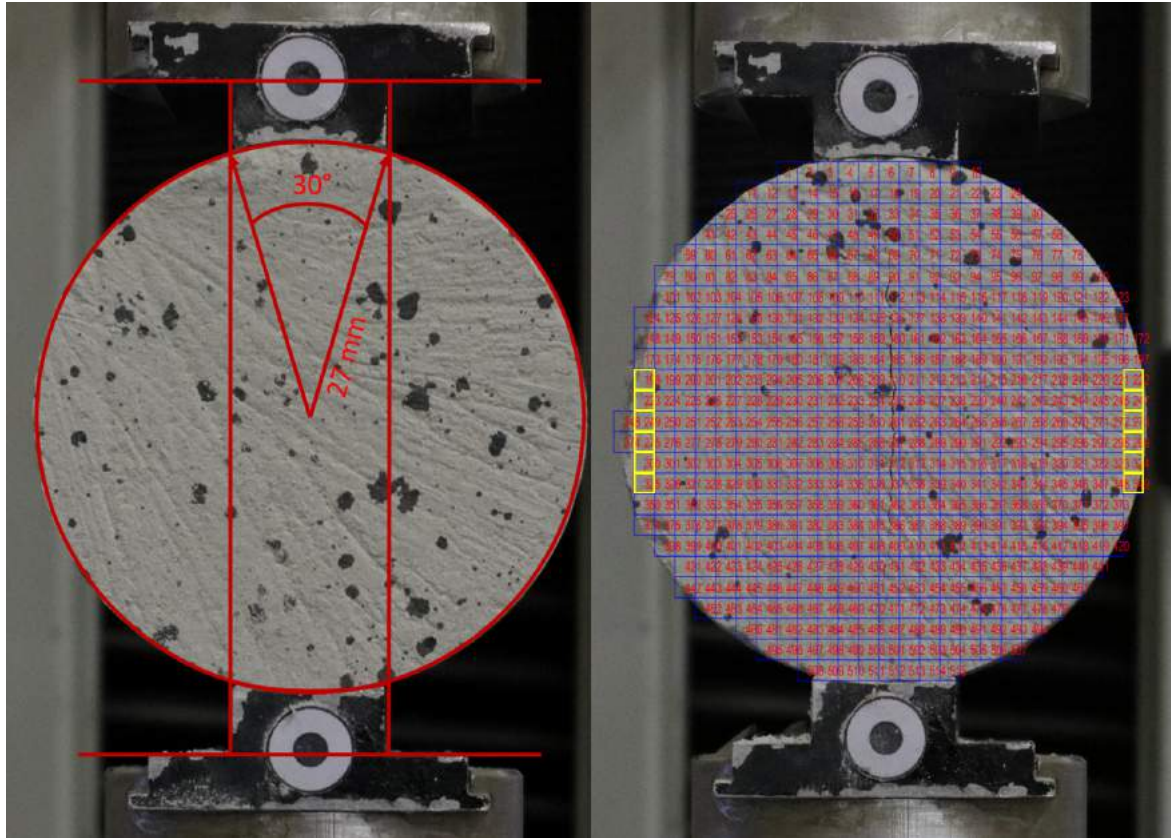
BDT Test setup (left) and failed specimen indicating subsets (right).
